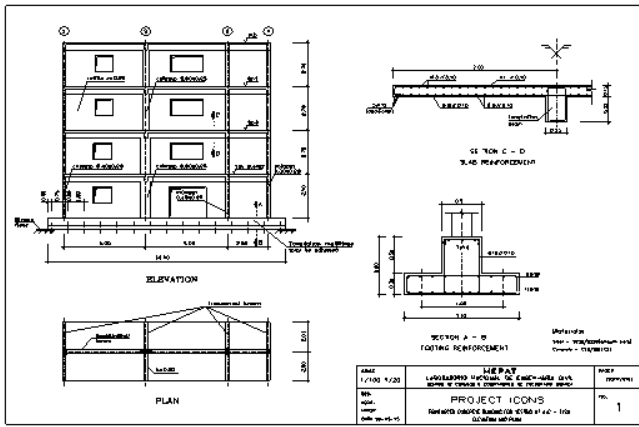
Plan and elevation views of concrete frame plus masonry infill building.
